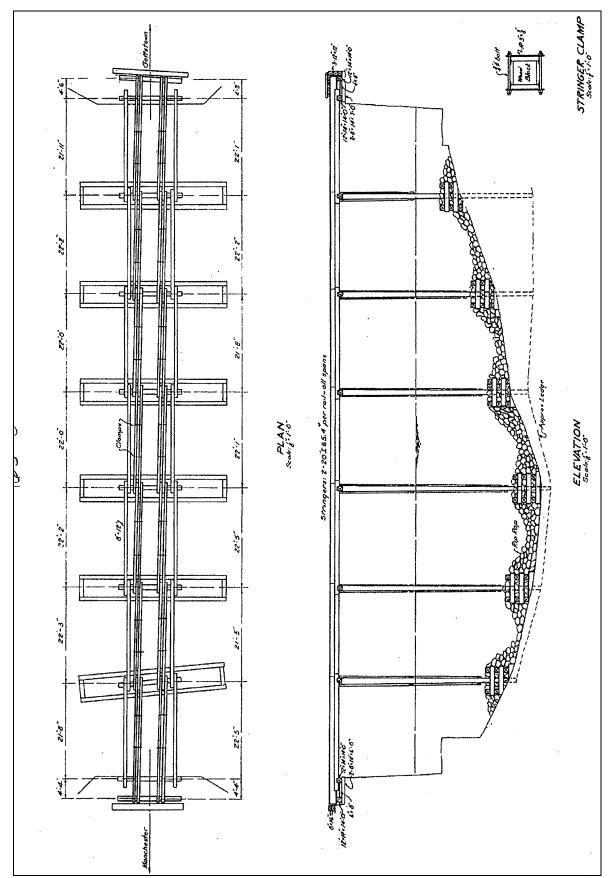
B&MRR Bridge No. 1.89 over Piscataquog River, West Manchester, NH. Plan and Elevation. [Source: "Record Plan, B&MRR Bridge No. 1.89 (404) West Manchester." Dated 3/10/42]
